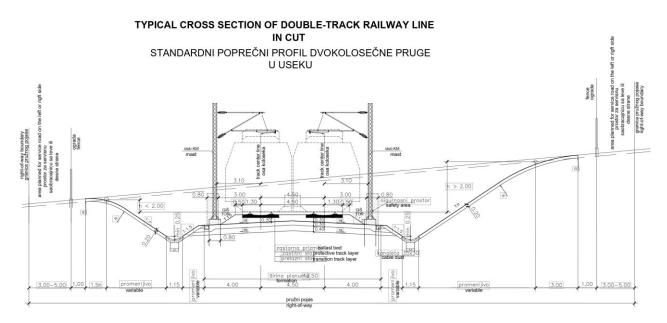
TYPICAL CROSS SECTION IN CUT
